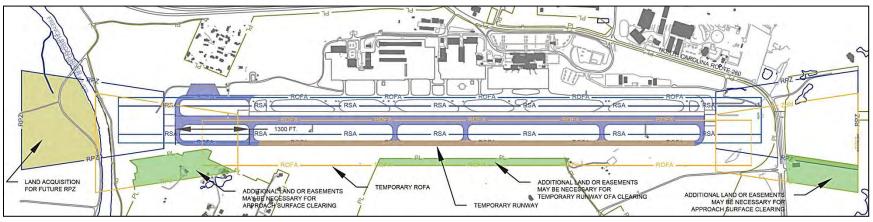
Alternative 5 – Extend Runway 1,300 Feet To The North
